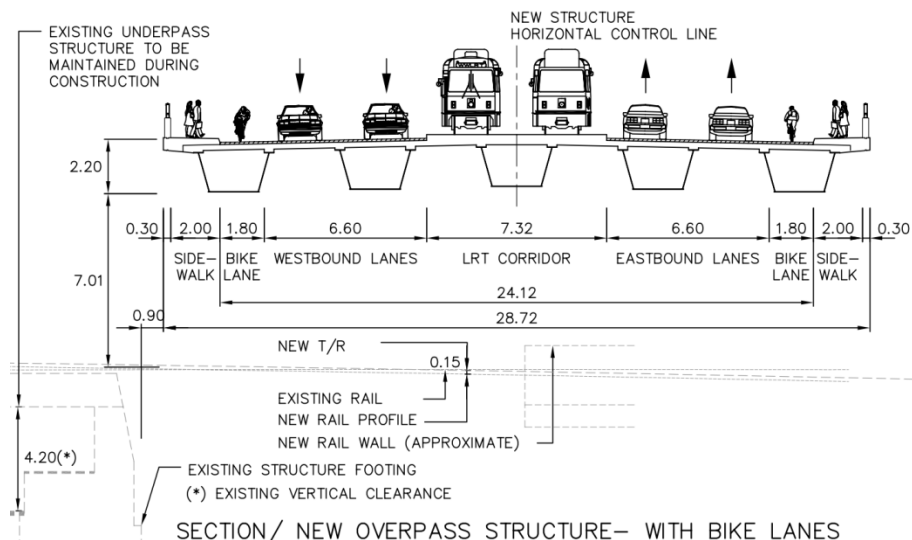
Option 1(C) - Cross-Section for New Overpass Structure
